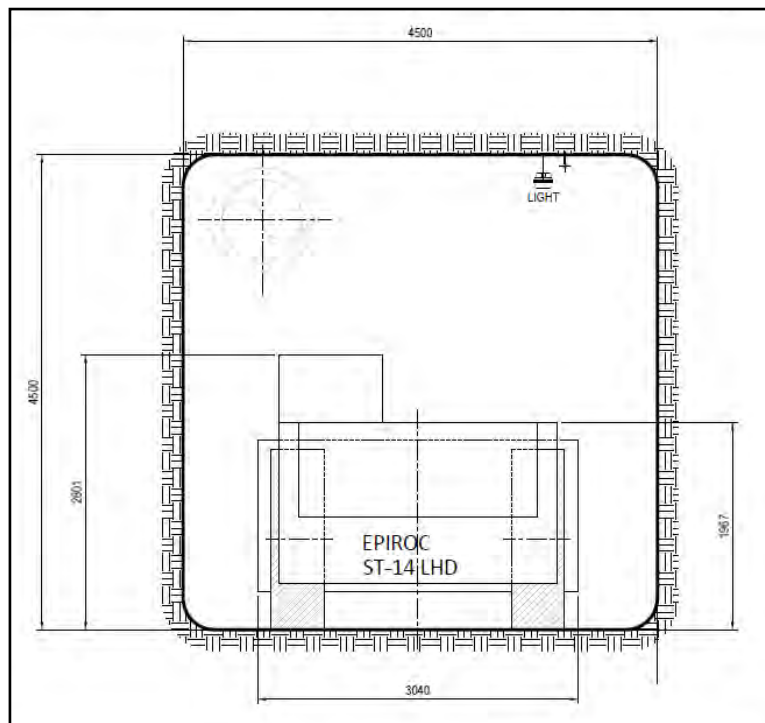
Ore Drive Showing 14-tonne Loader.
